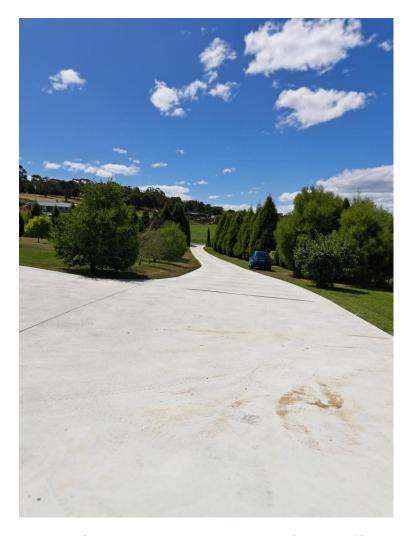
View of concrete driveway from proposed garage area to the front gate (Source: IBoss - December 2022)
